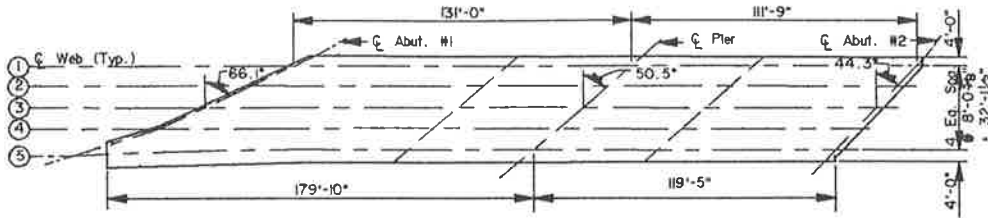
Sectional Framing Plan for EB Council/Toole Ave. Bridge
